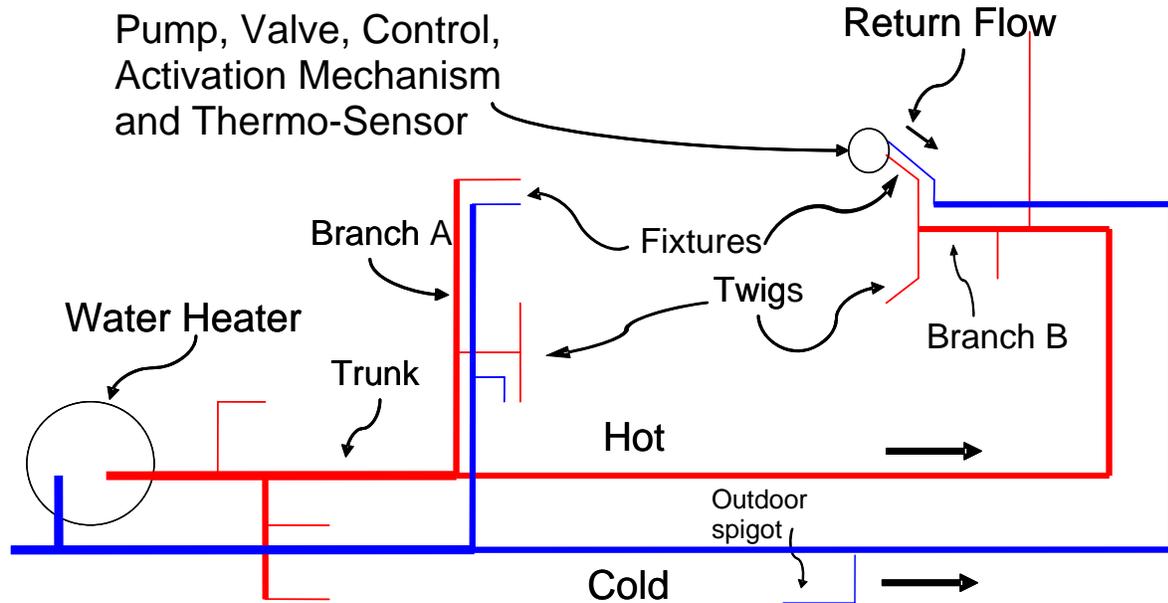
Single Trunk, Double Branch and Twig Plumbing Layout with Demand Controlled Pumping on Branch B, Using the Cold Water Line as the Return
